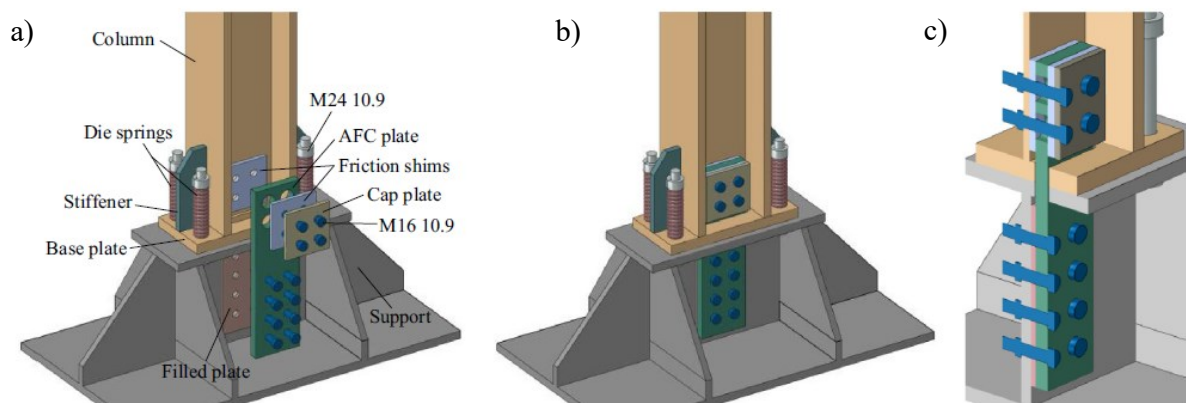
Zhang *et al.*, 2022 [152] Schematic diagram of CB: a) Exploded view; b) Assembly view; c) Cutaway view.
